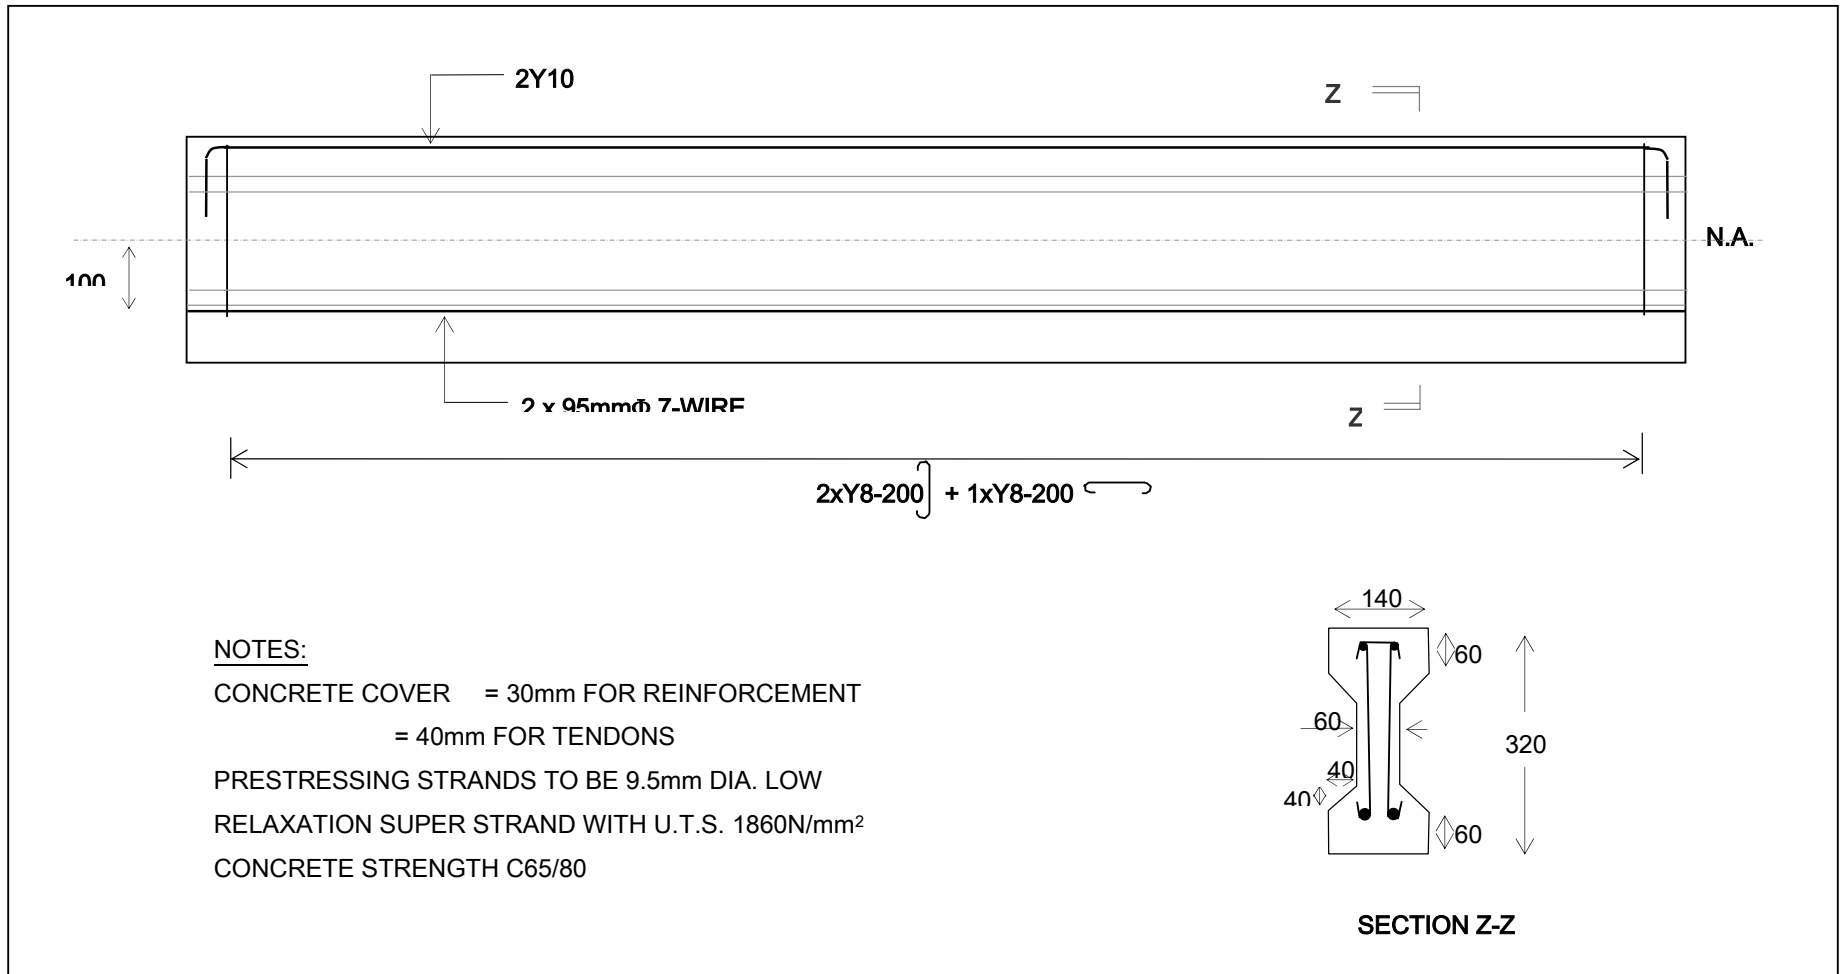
Details of prestressed beams designed and tested in the laboratory
